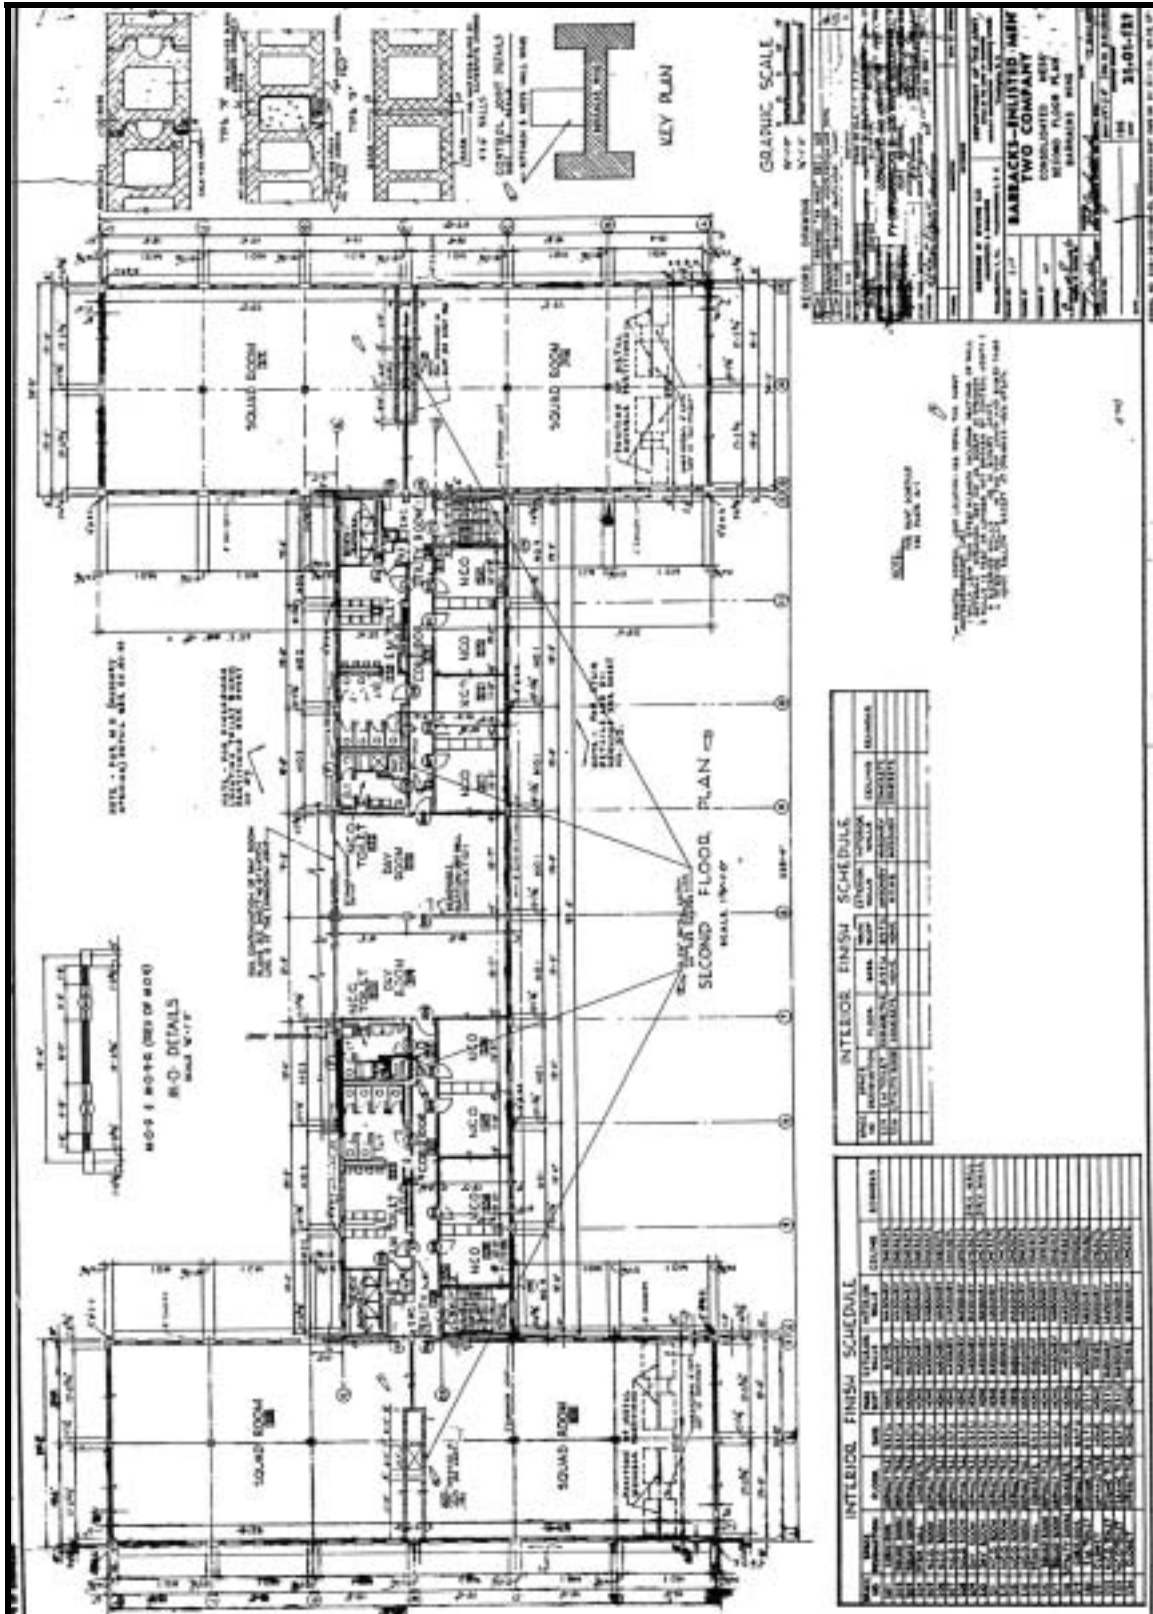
H-style, two-company barracks, barracks wing, second floor plan (ca. 1955, revised 1958) (Engineering, Ft. Benning).
